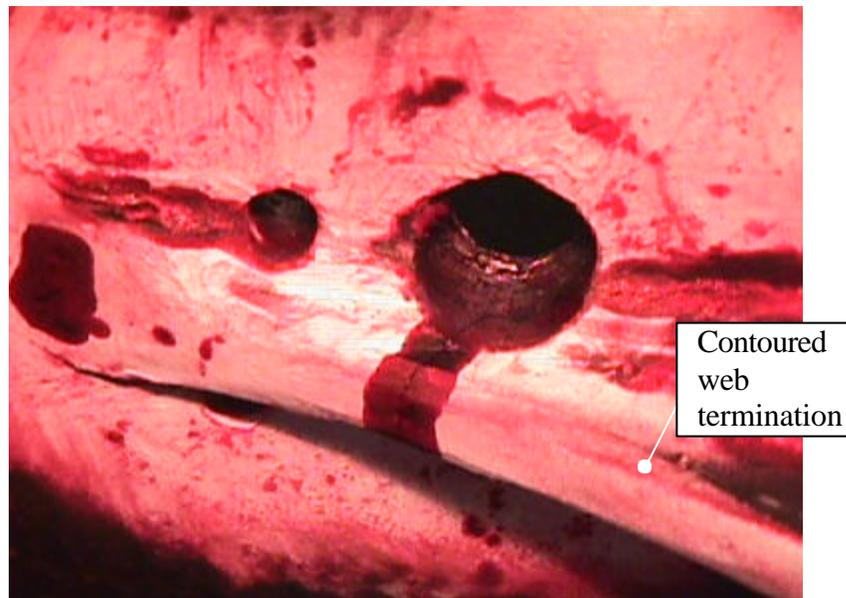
Detail of crack occurring in full penetration weld with tips drilled out.
